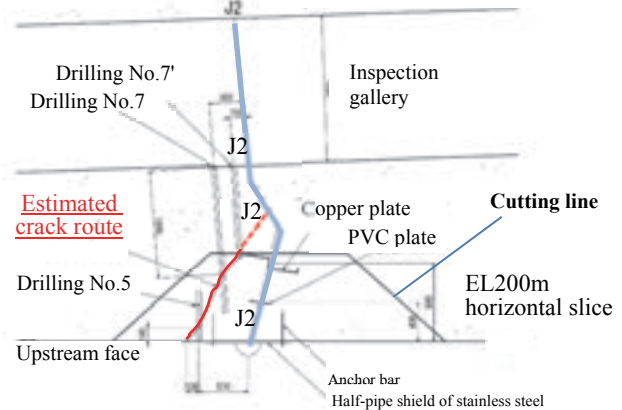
Crack survey plan by drilling near the J2 at EL200m
